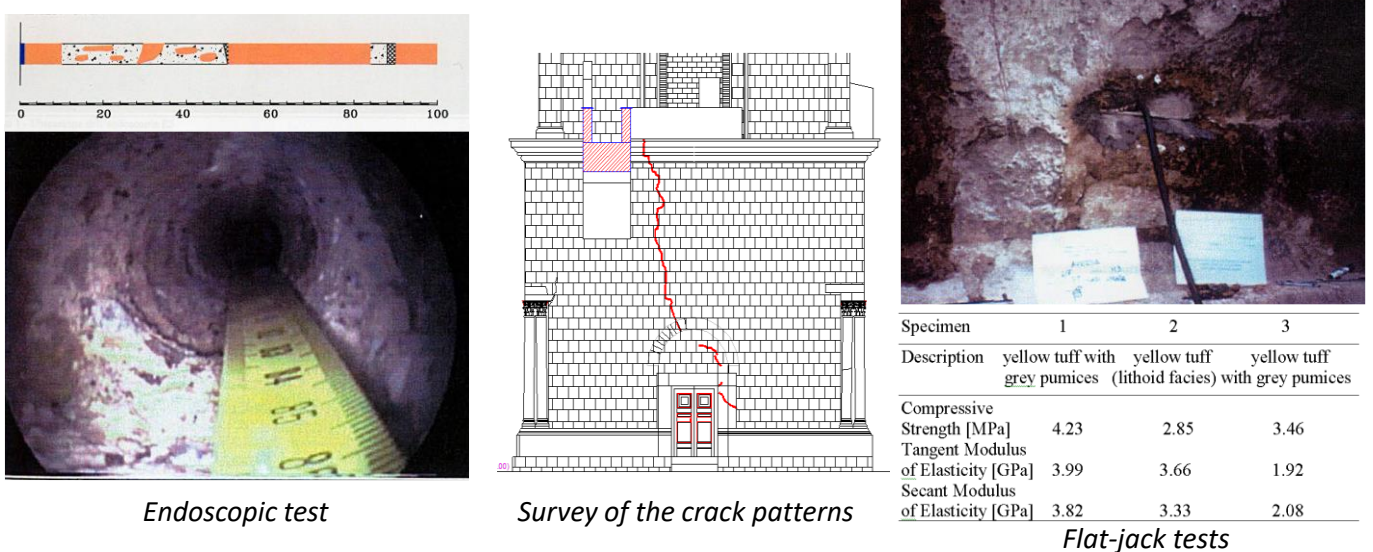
The bell tower of the Cathedral of Aversa: endoscopic tests, surveys of the crack pattern, flat-jack tests
